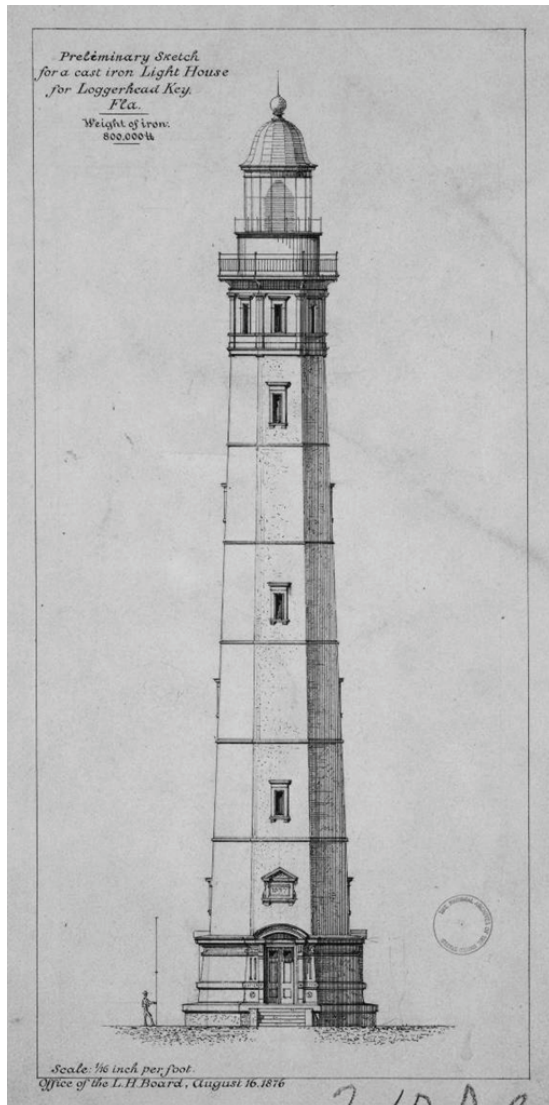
Elevation of iron tower proposed to replace storm-damaged masonry tower
